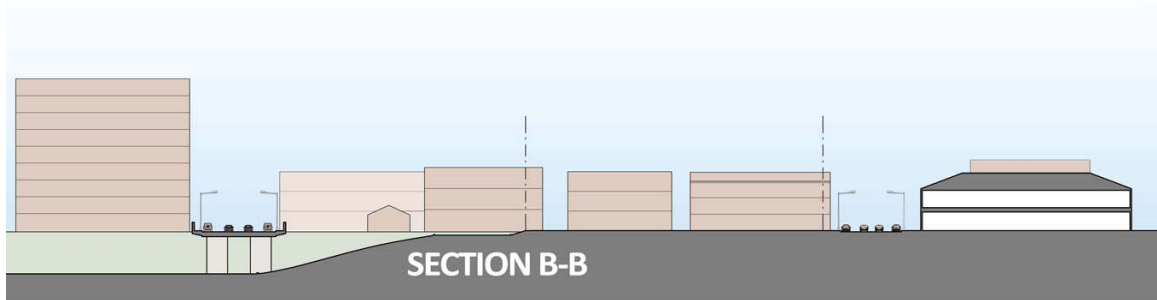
Site C; Section through St. Paul Street bridge, Site C, and Univ. of Balt. Liberal Arts Building
